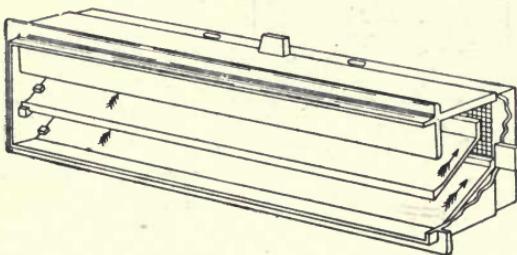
Wall Box with Louvre Slats and Netting, Direct-Indirect System.
